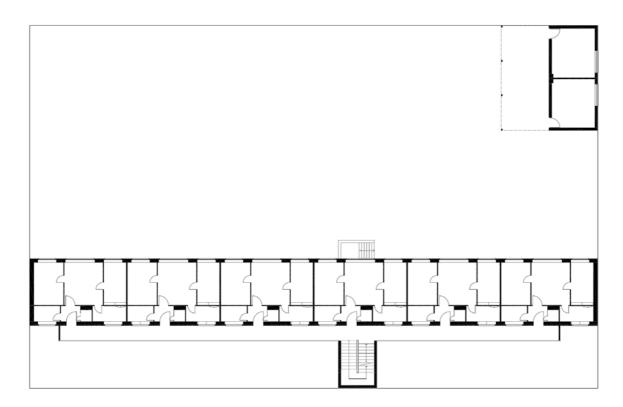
House with Balcony Access and plot boundary, layout of flats and washhouse 1930, plan 2006, Bauhaus Dessau Foundation
